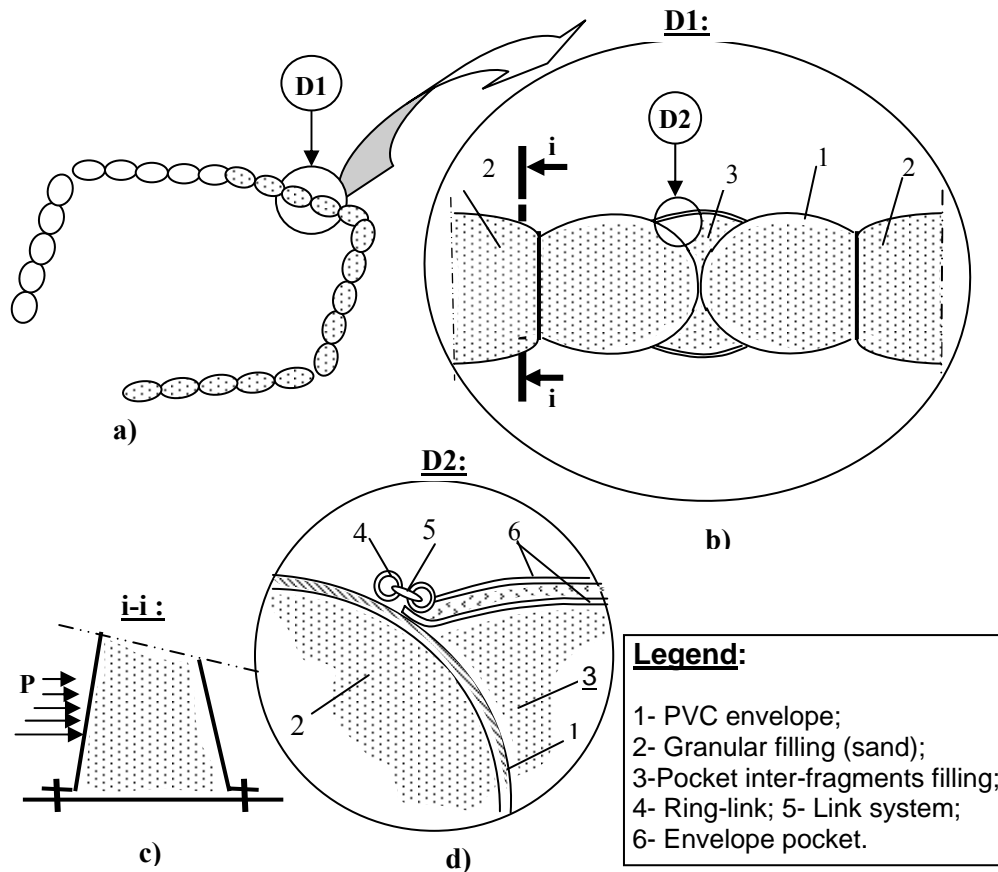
a)- Shape in plane of building with wall fragments; b)- Detail (D1) of constituted fragment wall; c)- Vertical cross section (i-i) of the wall. d)- Detail (D2) of fragments connecting.
